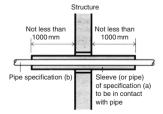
Pipes penetrating a structure Make the opening in the structure as small as possible and provide firestopping between pipe and structure.
